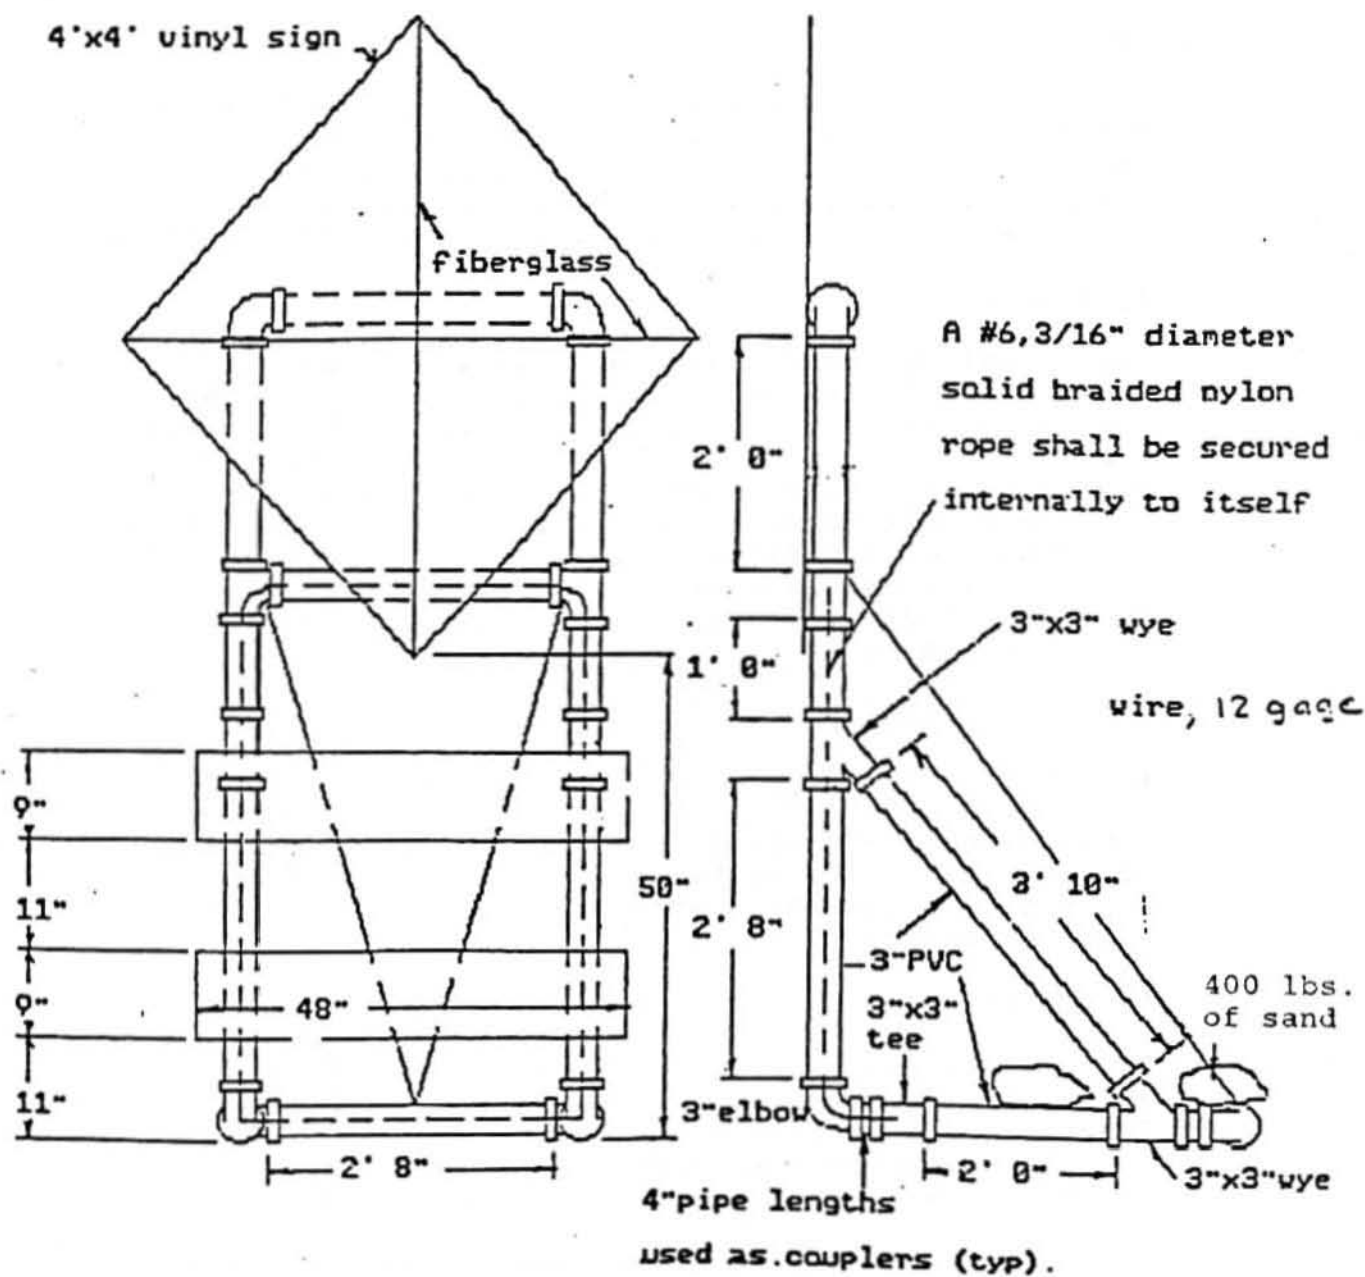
Breakaway Barricade For Test No. 11 and Test No. 12
